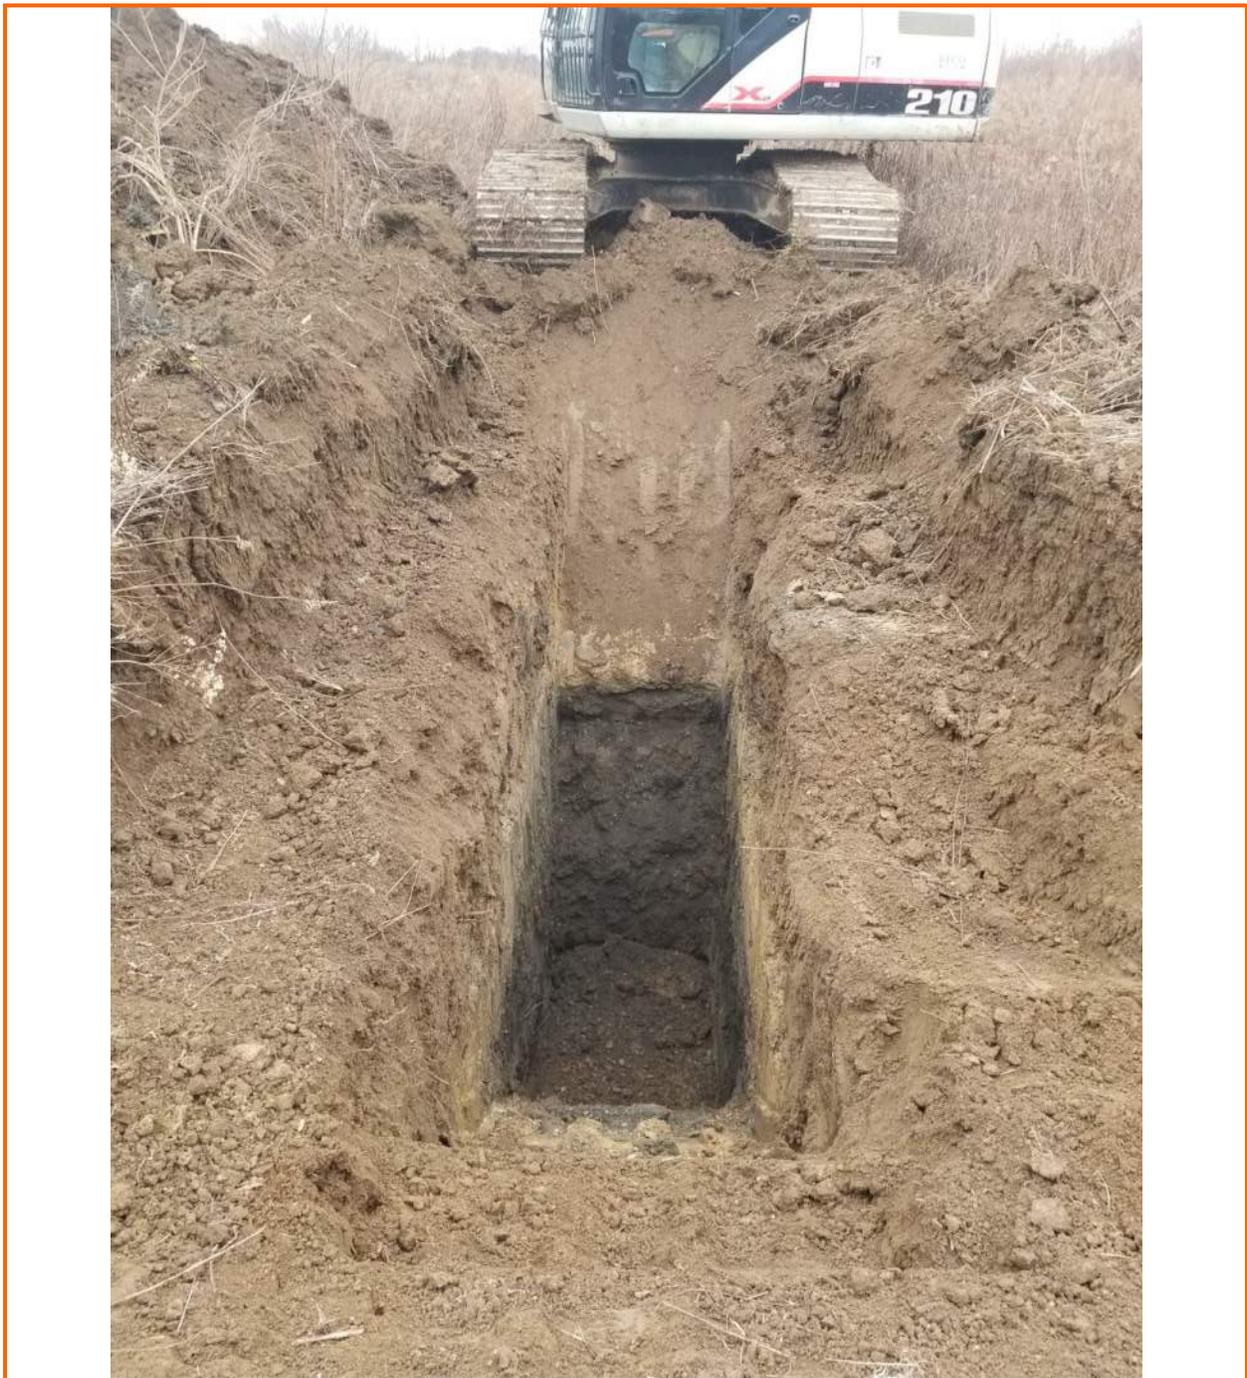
Exposed subsurface conditions at Test Pit TP-5 facing north
